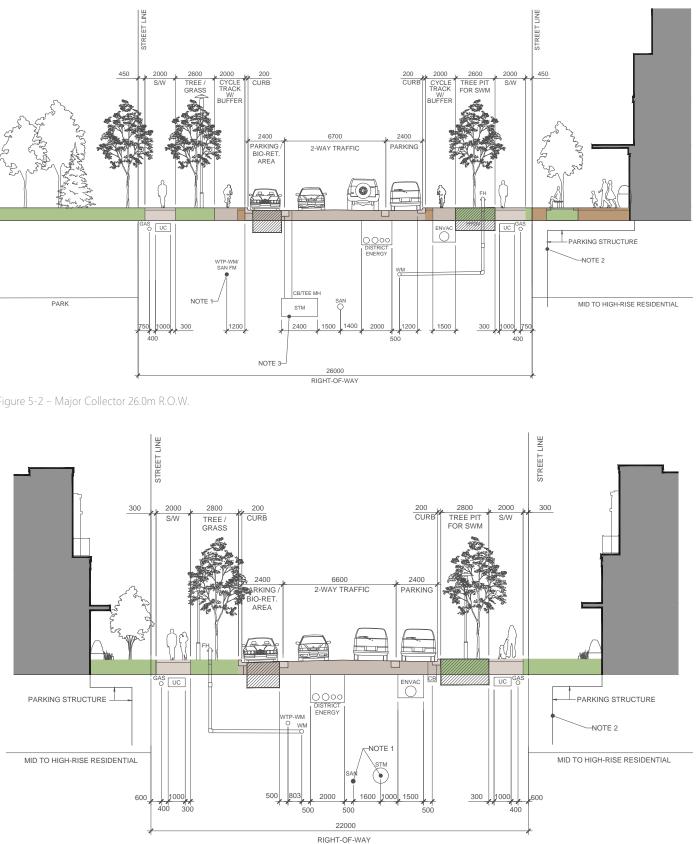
Street 'B' (New Aviator Avenue) 22.0m R.O.W.
